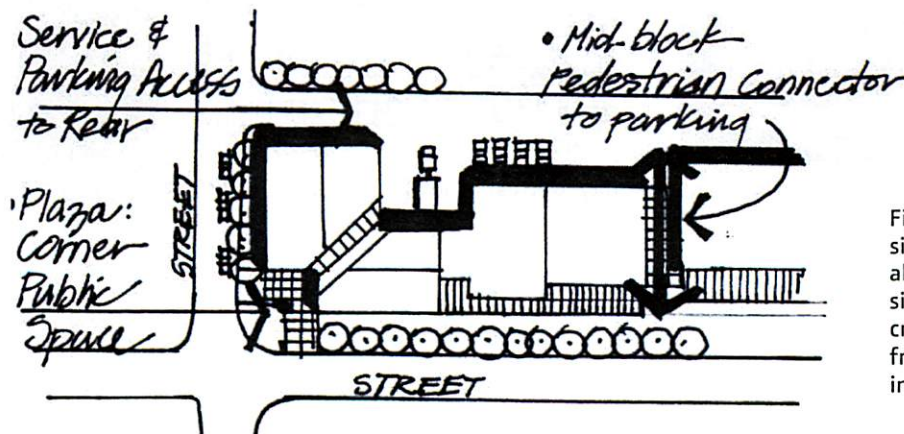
Locate parking to the side and rear of the building allowing the building to be sited close to the street and create a more pedestrian-friendly streetscape that is inviting.
